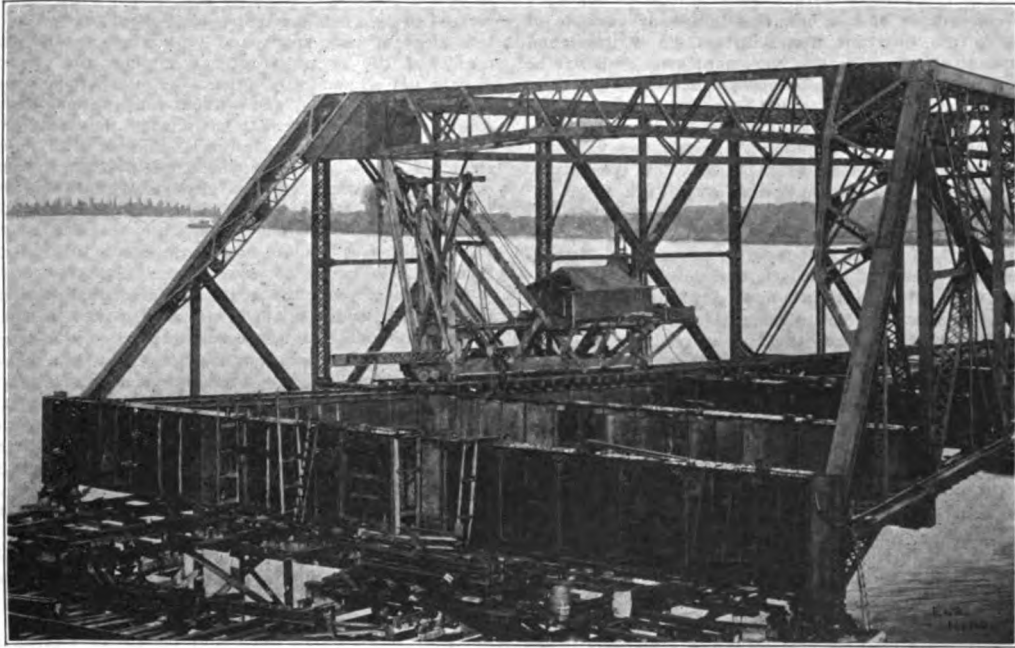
VIEW SHOWING ERECTION OF FLOOR SYSTEM FOR SPREAD SPAN.
